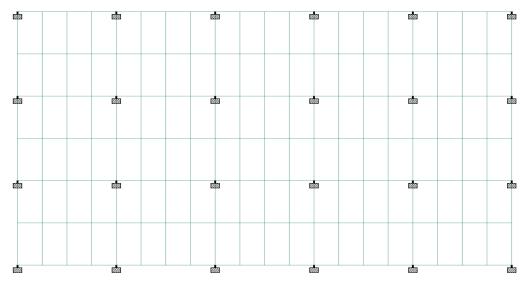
Plan view of flat plate model corresponding to RC frame Model in STAAD
